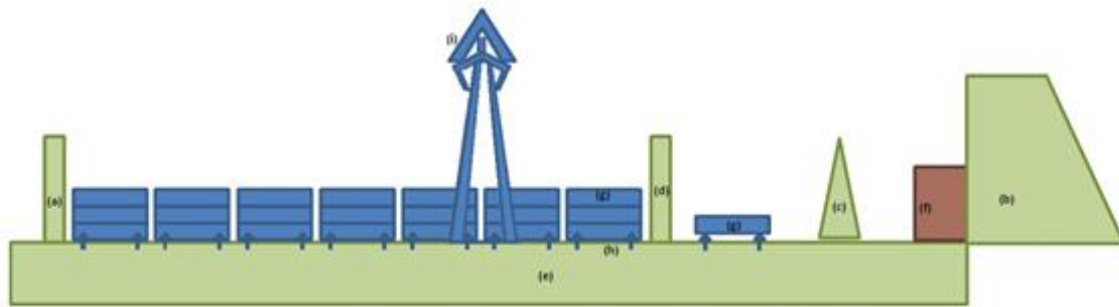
Rafts 13/14 cross section (looking West with East shield wall removed)
